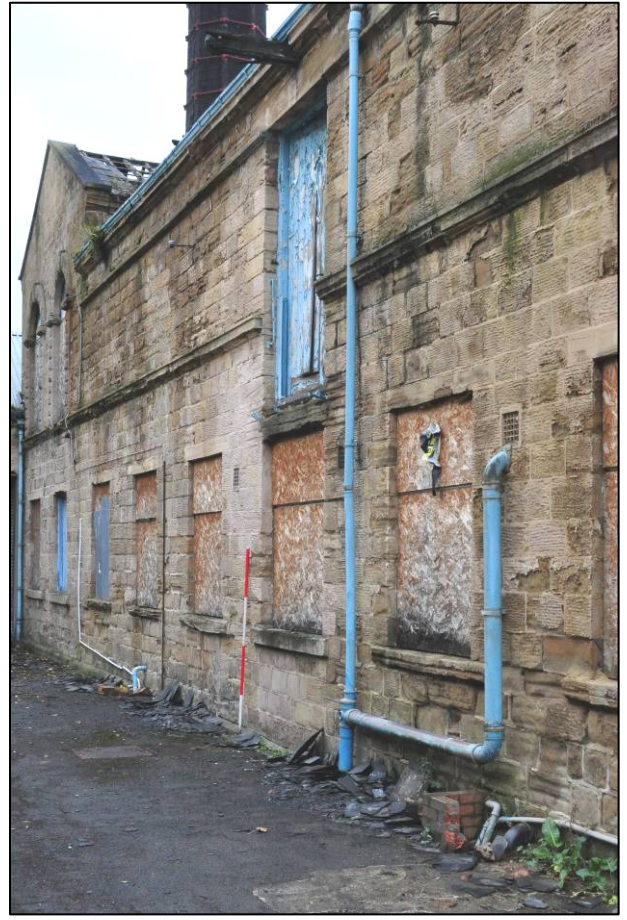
Ilkley Road frontage, c.1857 original part (Unit G), western loading door and windows, looking NW (photo 11744).
